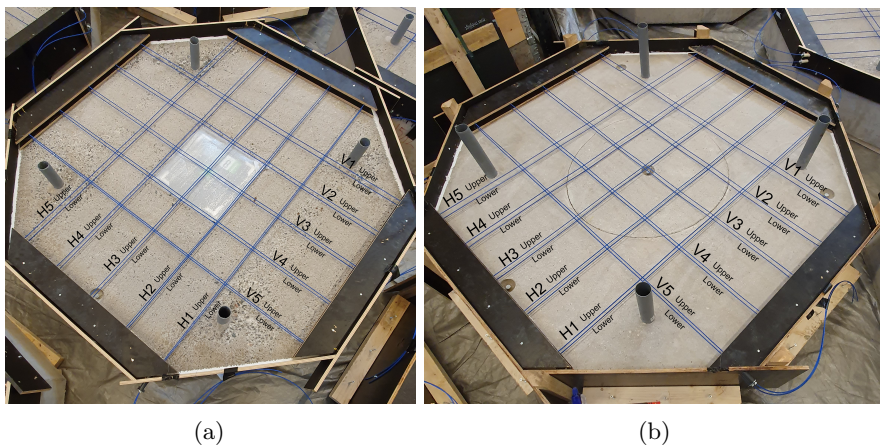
Cable arrangement (blue cables) for a) bag-loaded specimens and b) cone-loaded specimens prior to casting of the top FRC layer.
